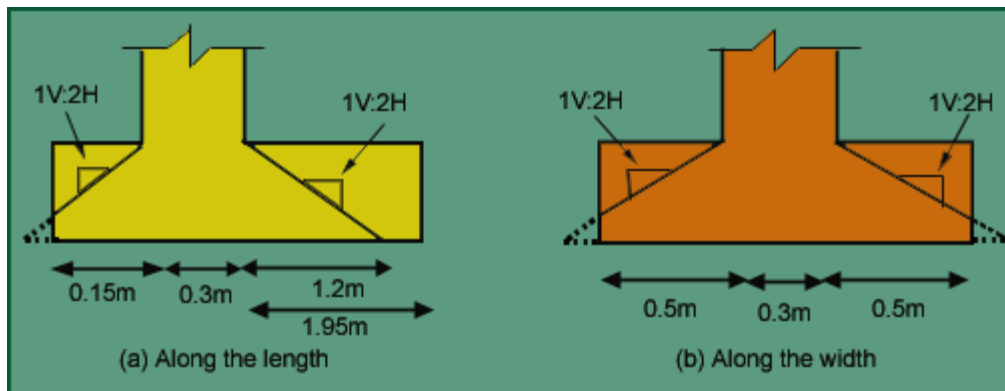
Area of footing A considered for check of transfer of load at column base
